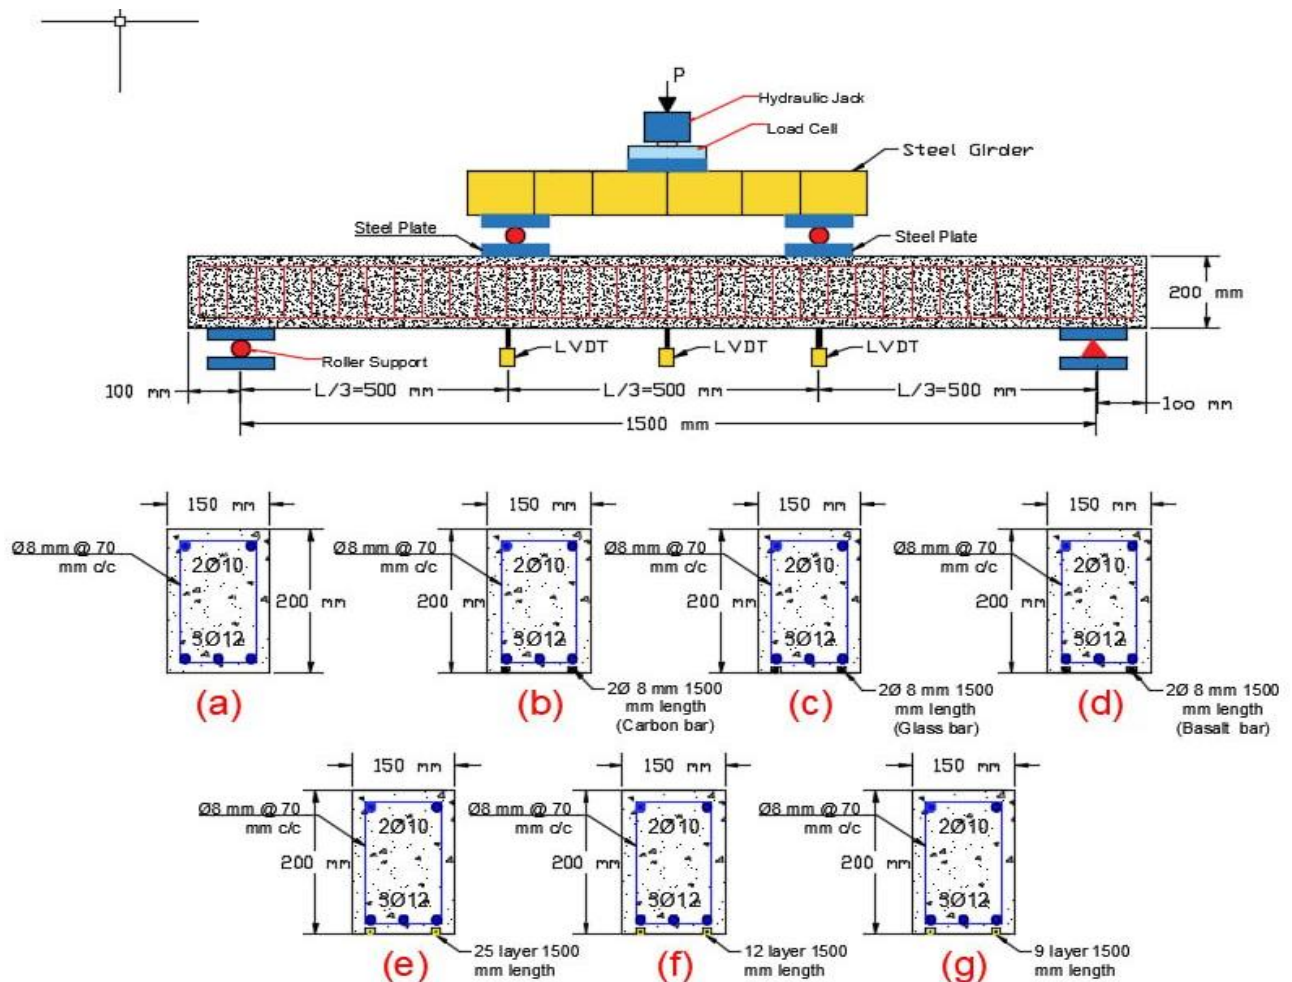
Details of cross-sectional dimensions, strengthening, and reinforcement of beams (CB, NCb, NGb, NBb, NCs, NGs and NBs).
